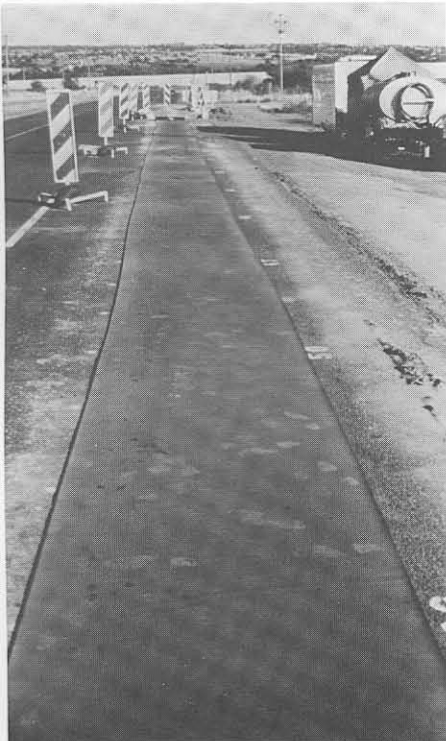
RELATIVELY DEEP PAVEMENT: ROAD 1932 – CRUSHING FAILURE AT THE END OF THE TEST (143 000 REPETITIONS) ON HVS TEST SECTION 338A4. DEFORMATION APPROXIMATELY 10 mm (TRAFFICKING SINGLE WHEEL LOAD: 150 kN; TYRE PRESSURE: 960 kPa).
